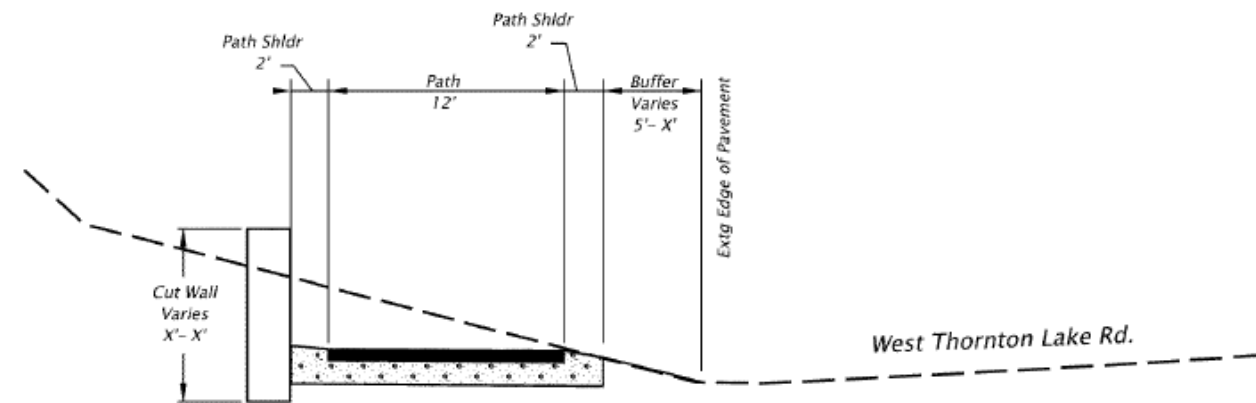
Alternative A3 Cut Wall Typical Cross Section
